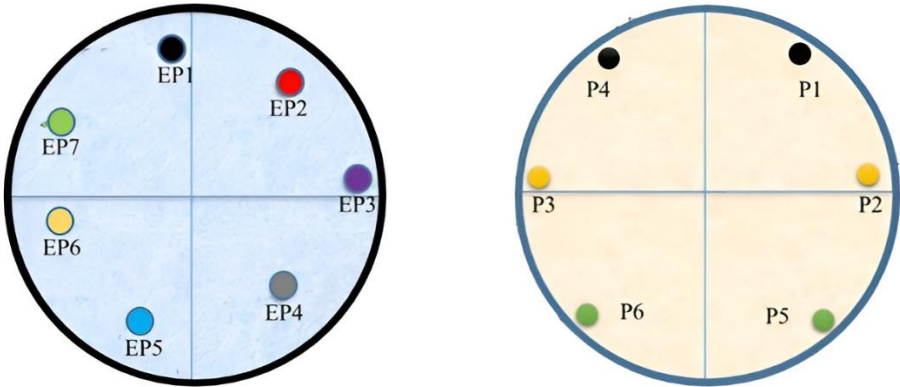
Positioning of face pressure and grout pressure sensors in the southern expansion project of Tehran metro line 6 [40]
